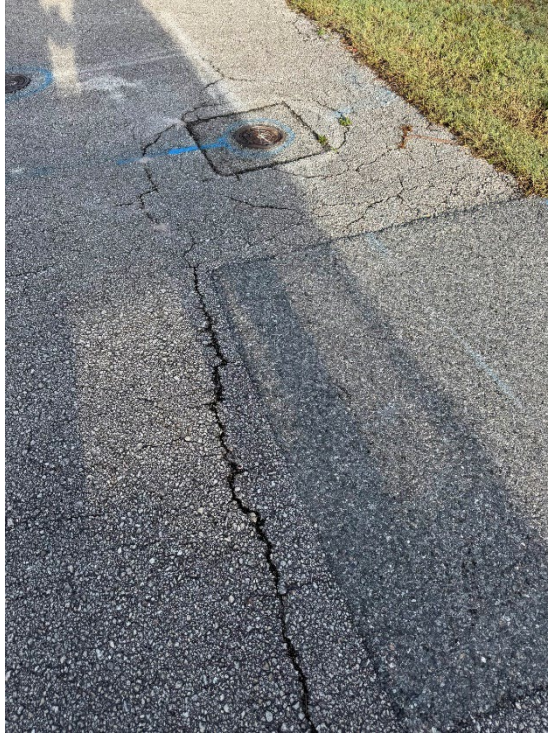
Typical Asphalt Raveling and Base Failure (No Observed Changes)
